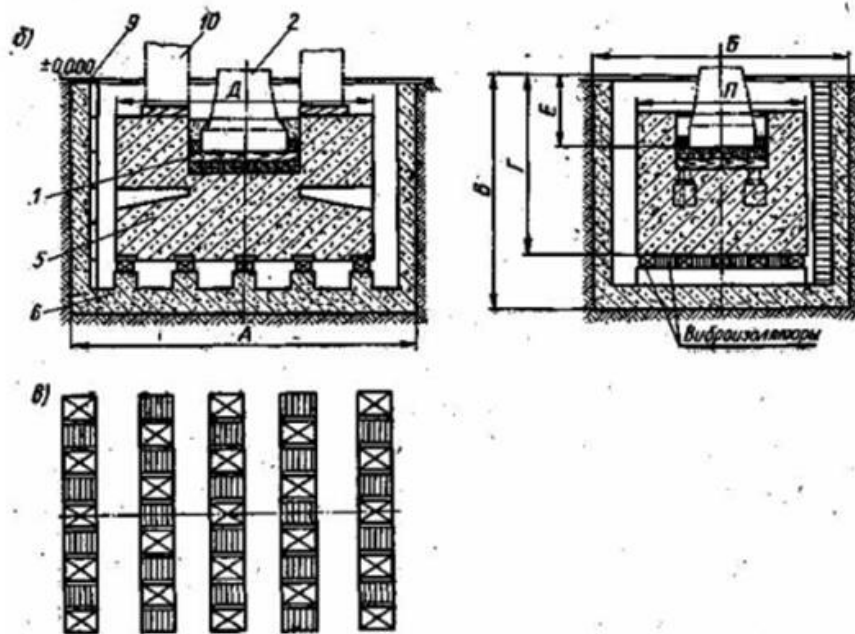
Schemes of the foundations under the steam forging hammers[13]: b – anti-vibration foundation, c – location of the vibration isolators; 1 – gasket under the anvil, 2 – anvil, 3 – concrete, 4 – ferroconcrete, 5 – foundation block, 6 – box under the foundation, 7 – beams, 8 – rammed clay, 9 – overlapped boxes, 10 – hammer frame.
